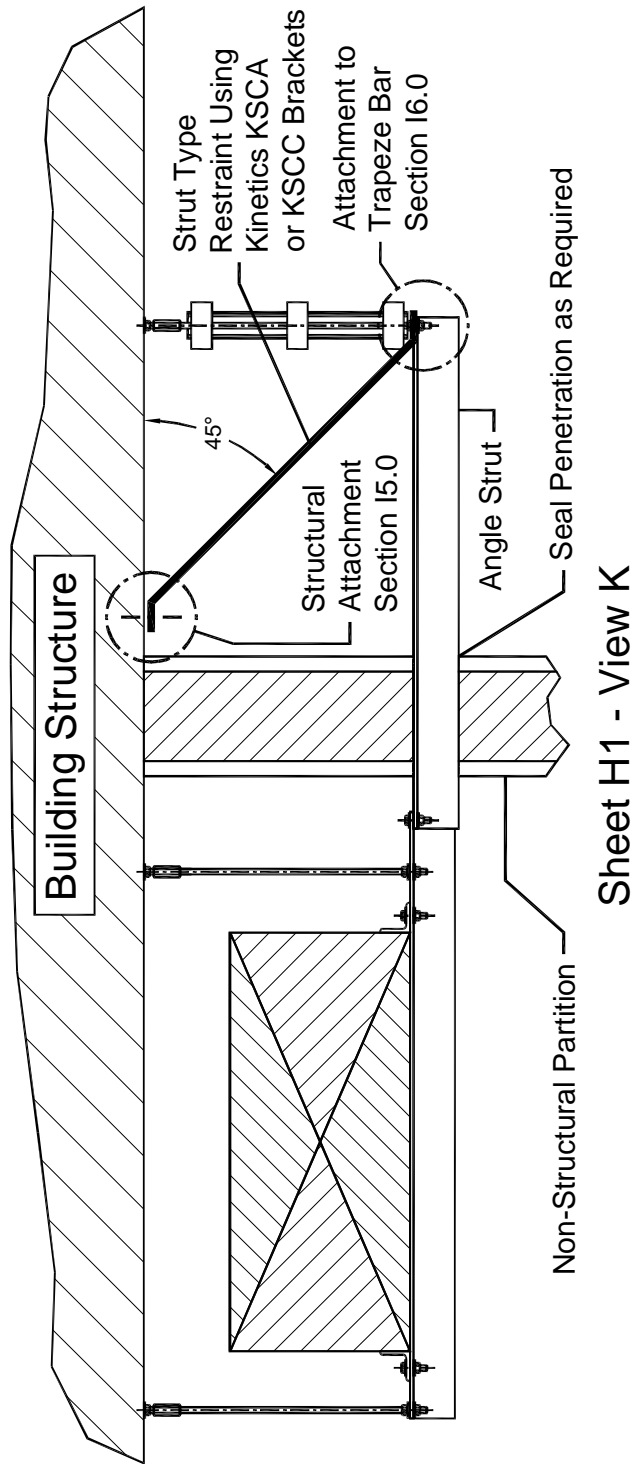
; Transverse (T) Strut Type Restraint Schematic for Supported Rectangular Duct – Trapeze Bar is Too Close to a Wall to Allow a Normal Restraint Arrangement – Obtain Permission from the Structural Engineer and Architect Before Penetrating the Wall
